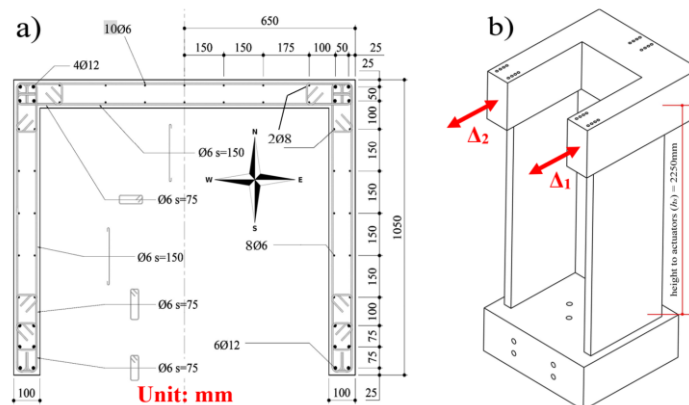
Test specimens UW1 and UW2: (a) cross-section and reinforcement layout, and (b) elevation view with the locations of displacement transducers. (Modified from Hoults *et al.* 2022).
